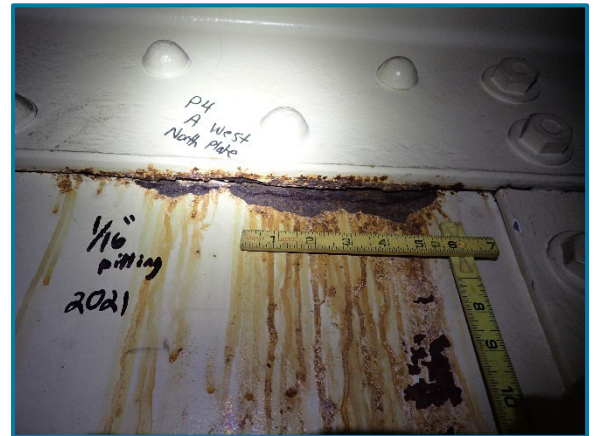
1/16" deep pitting at the north top flange angle and web plate at the west end of Pier Cap 4A (looking north).
